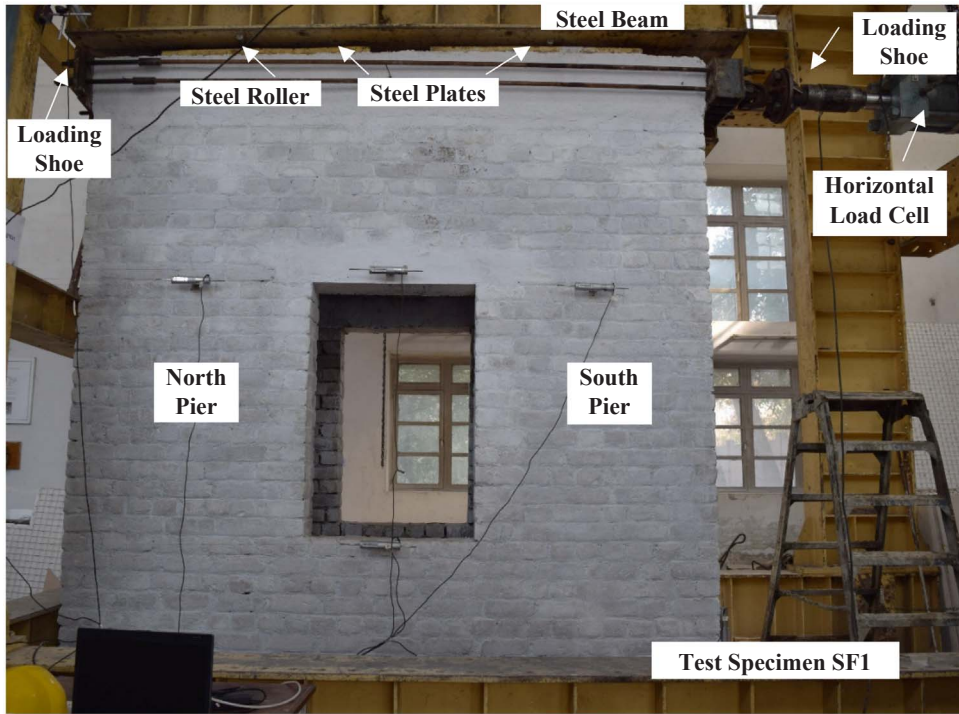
Instrumentation and loading assembly of specimen SF1.
